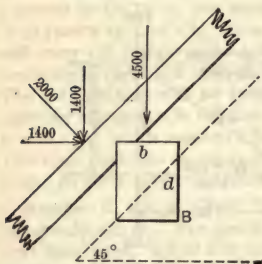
A. Purlin-design for Joint 2 of Truss Shown in Fig. 1
